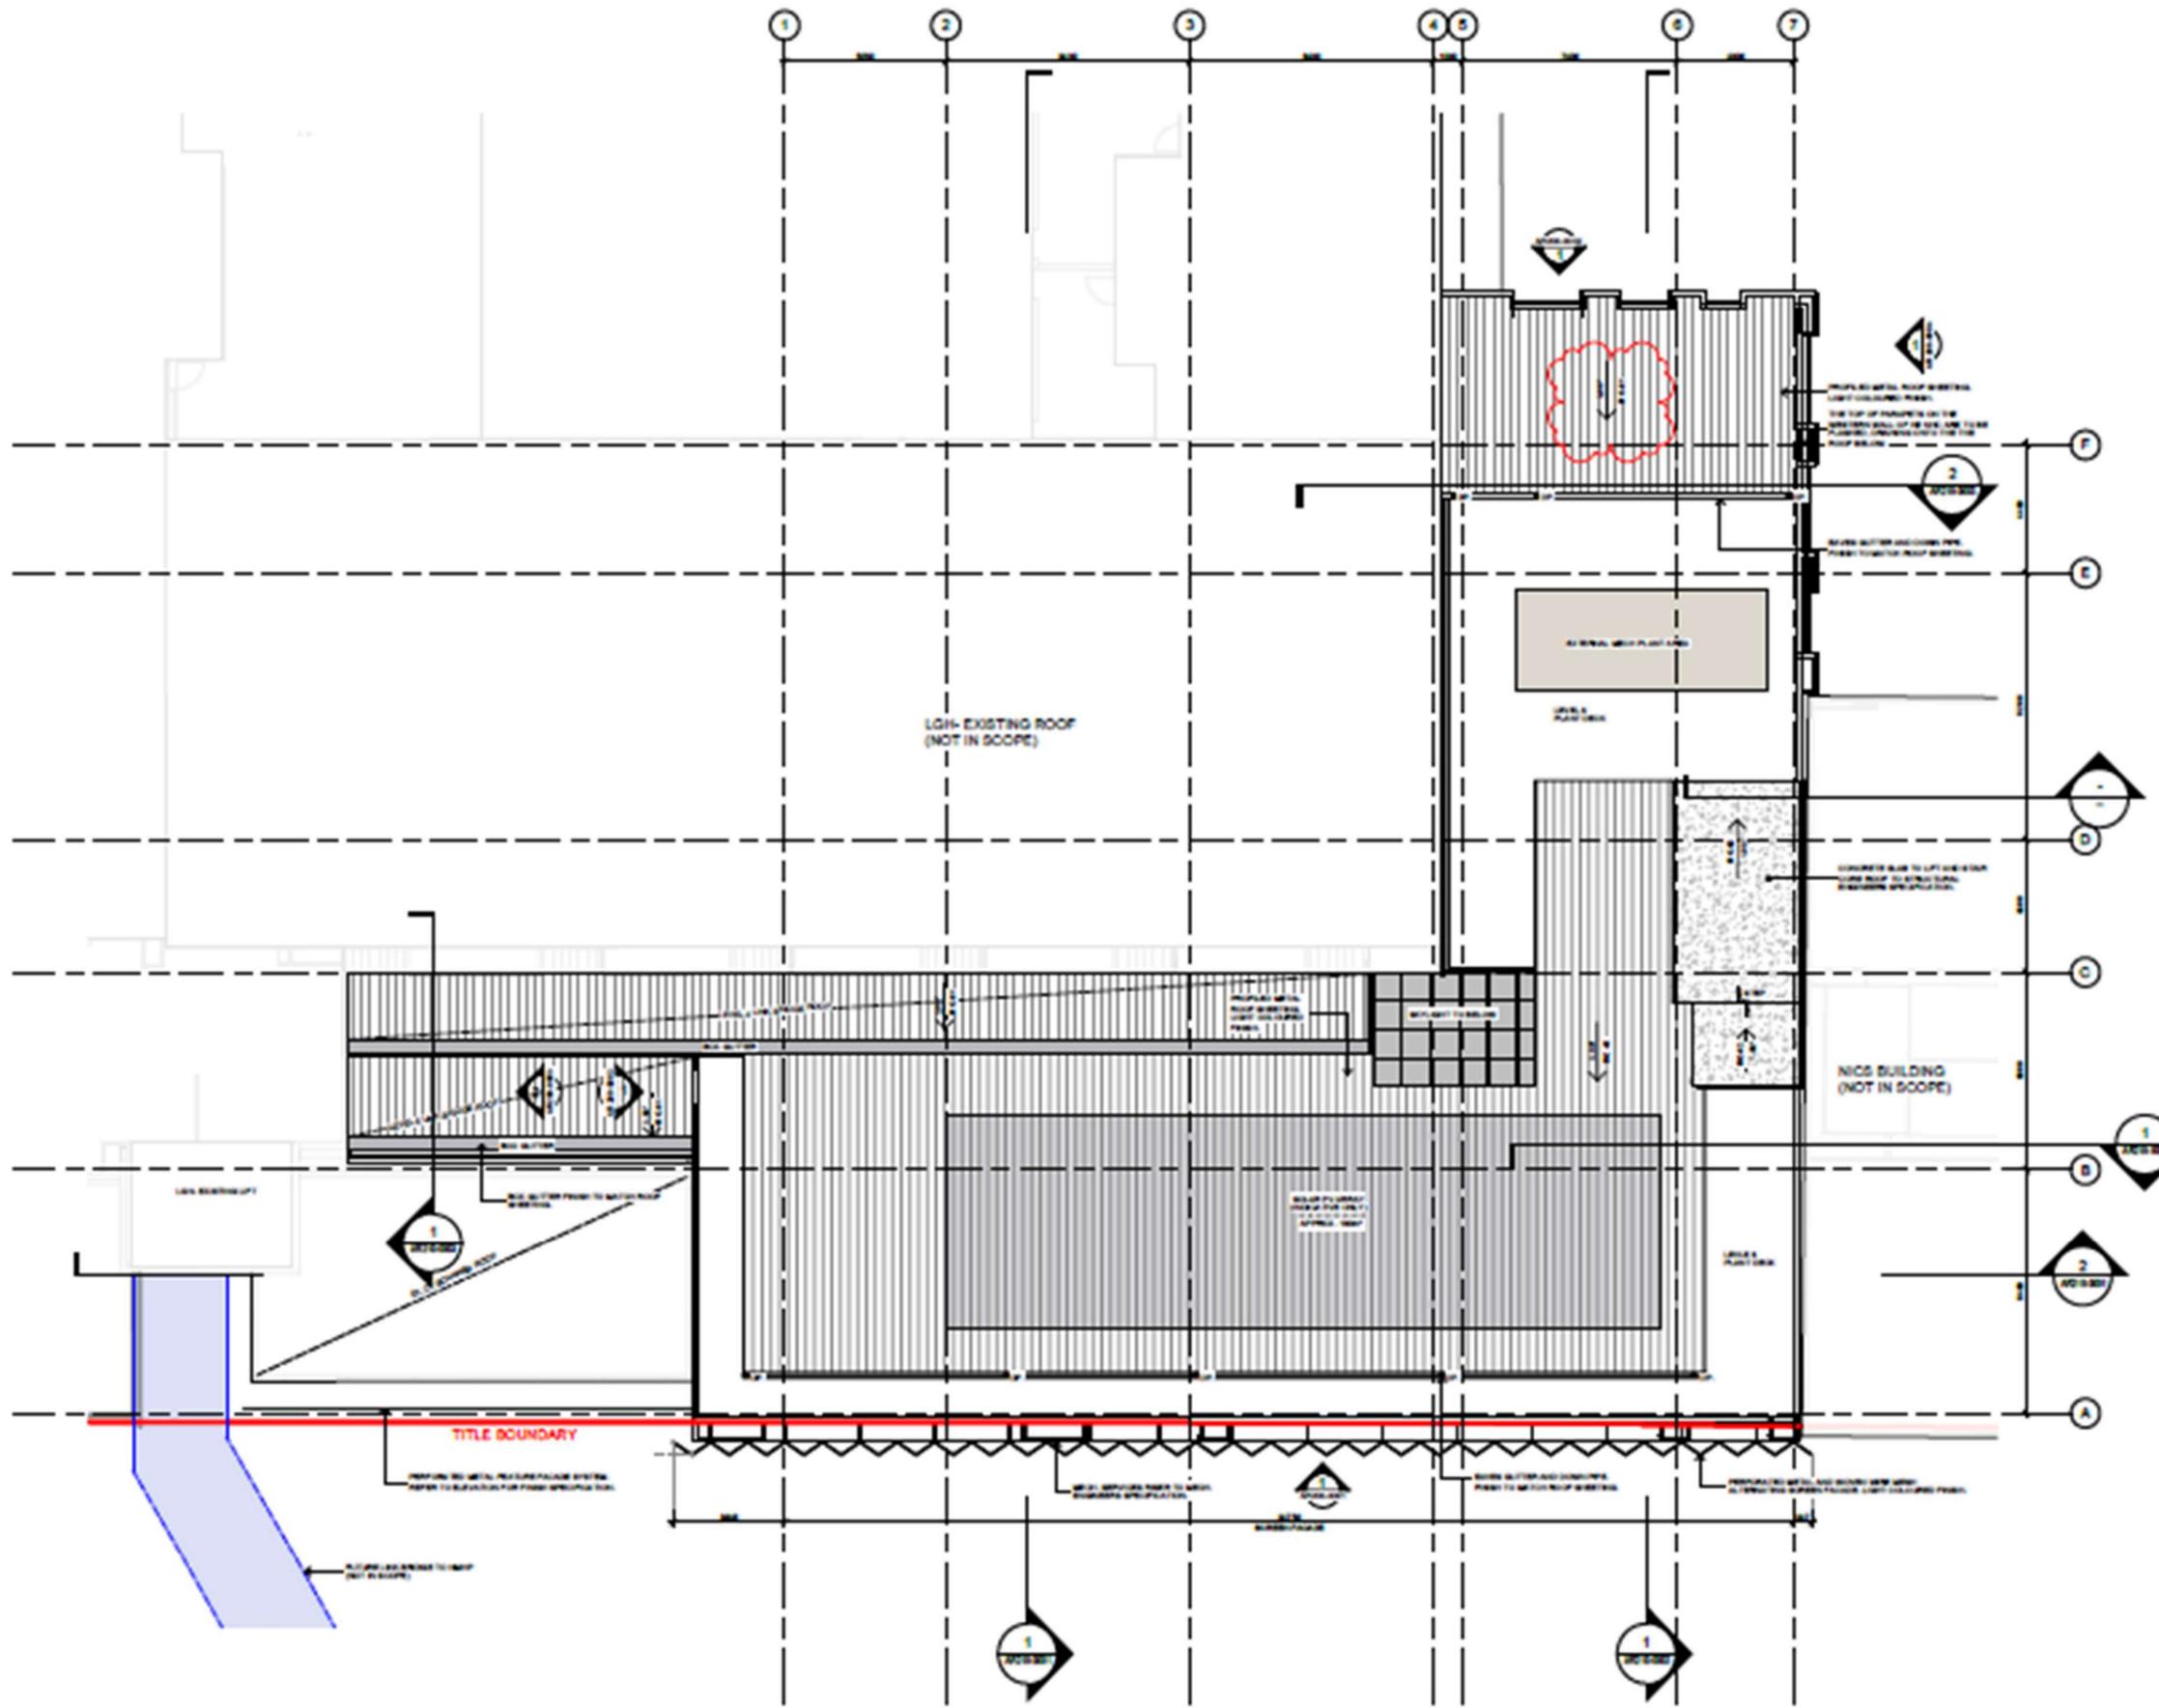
Northern Heart Centre Proposed Floor Plan – Roof (7)
